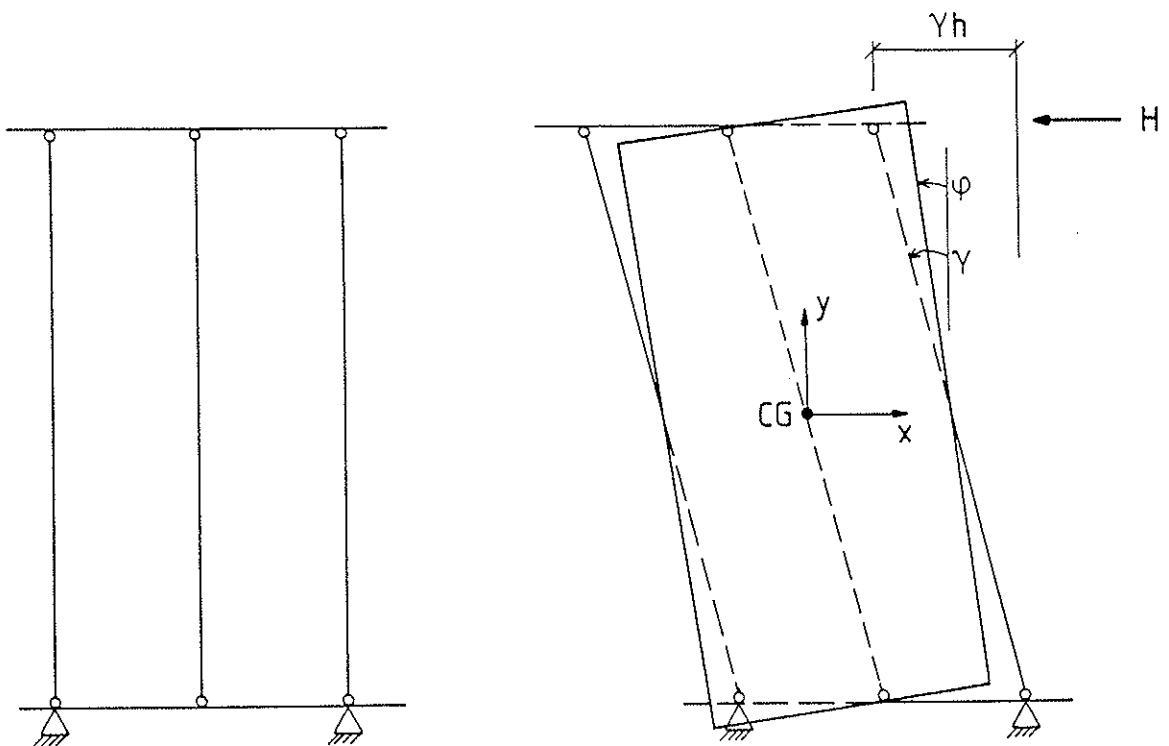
Static model of a wall unit in the unloaded and loaded state.
